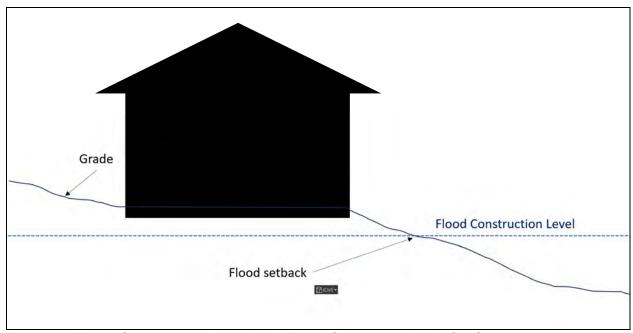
Flood Construction Level and Flood Setback suitable for SLR prone sites
